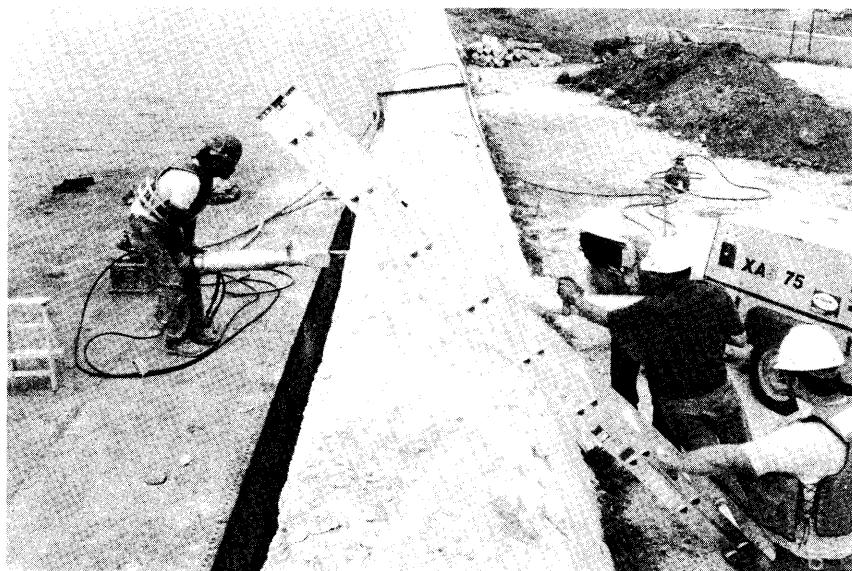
Concrete splitters being used to presplit top of channel wall for removal at Joliet, IL
